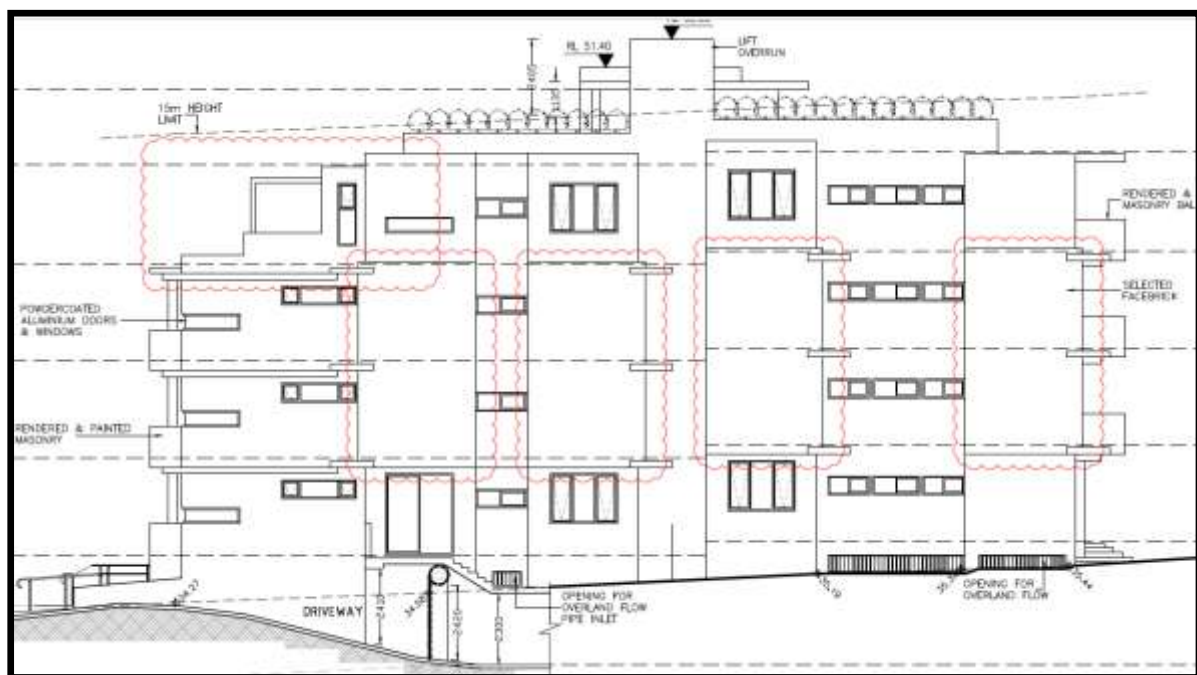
Amended south-eastern elevation (Courtesy: Cornerstone, March 2020)
